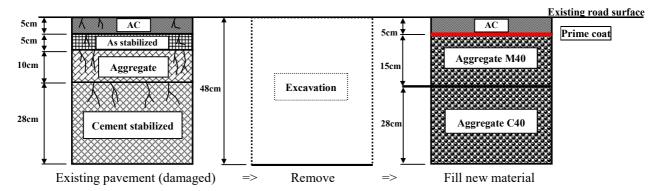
Spot Replacement of Damaged Pavement
